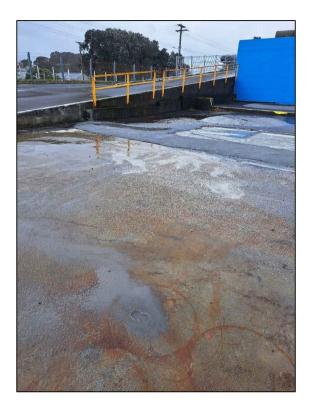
Welded fill point for process water piping adjacent to Building 09.
